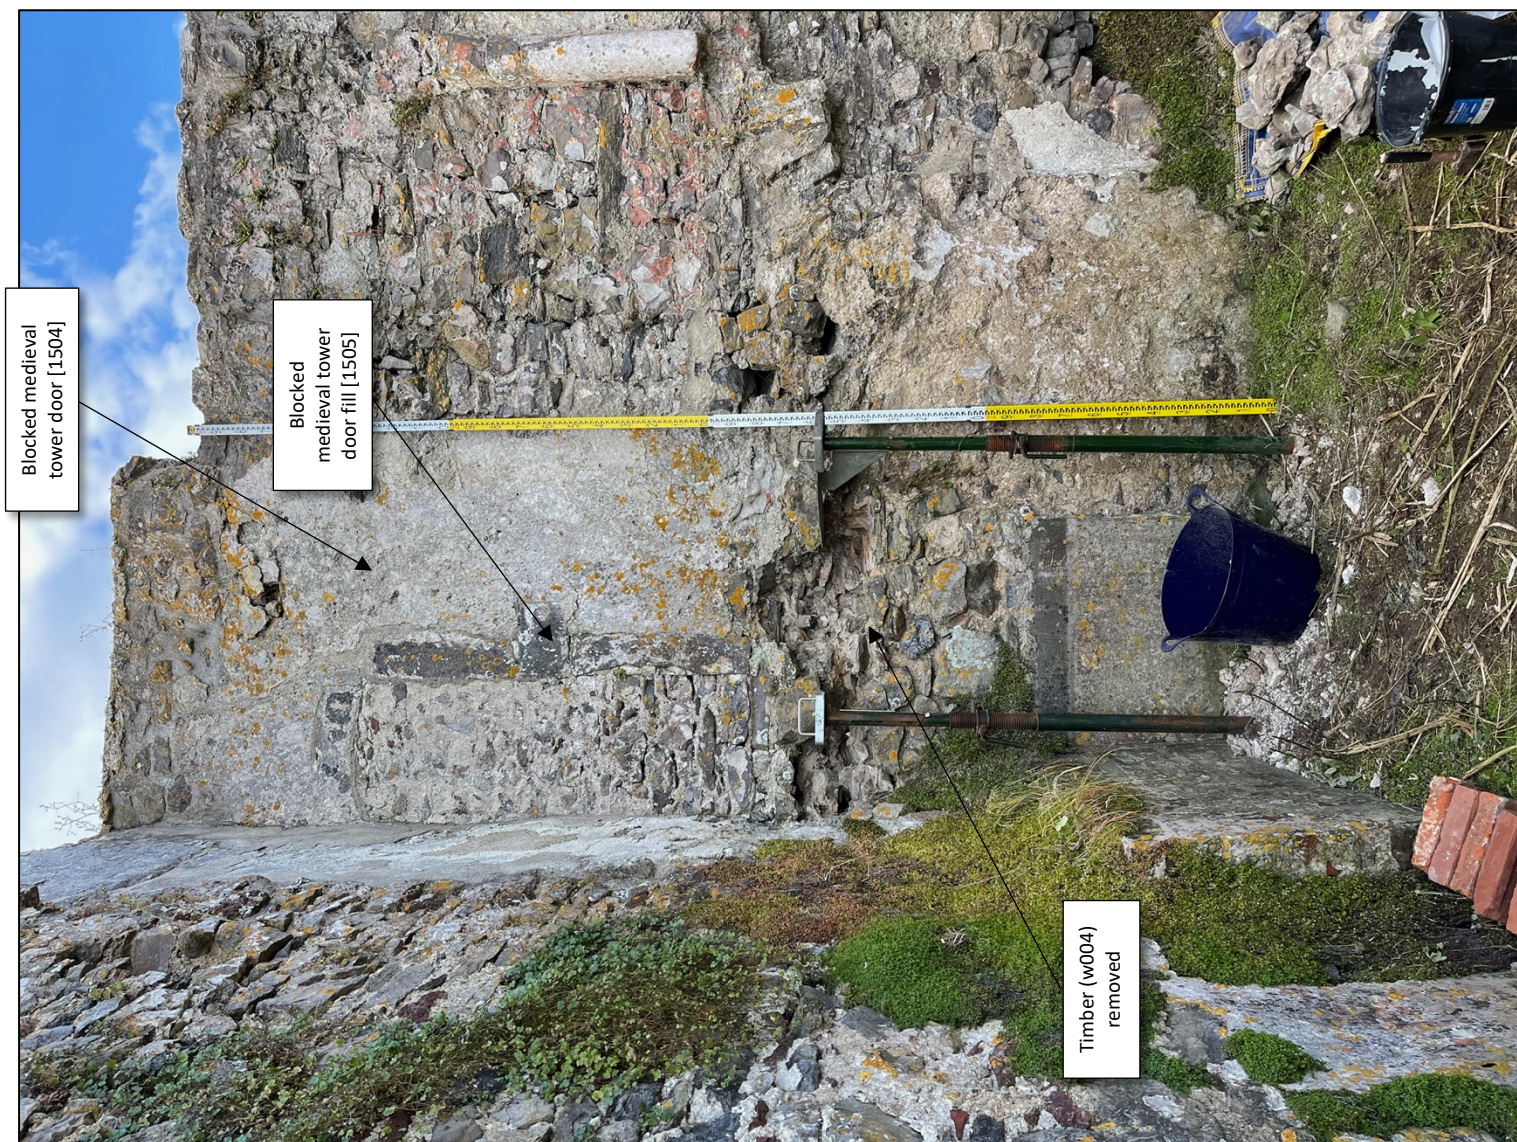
Location 15 Medieval Tower/19<sup>th</sup> Century Kitchen, view of NE facing wall with Timber (w004) removed.
